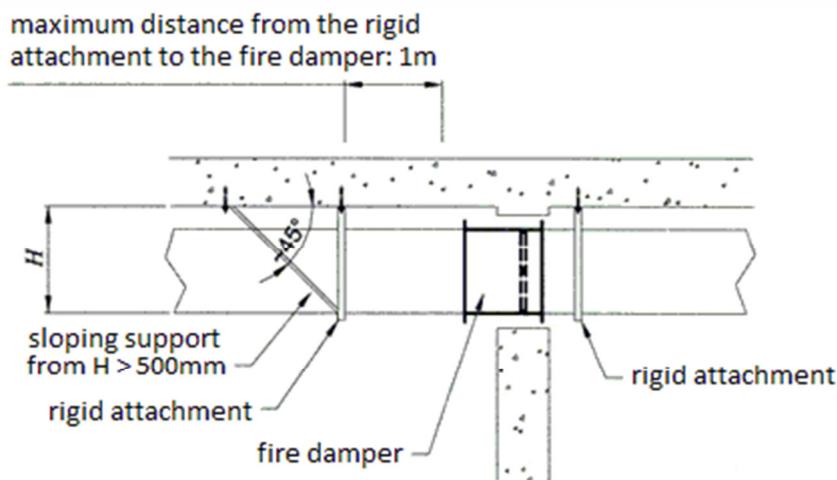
Example of a rigid ceiling attachment with a wall penetration
